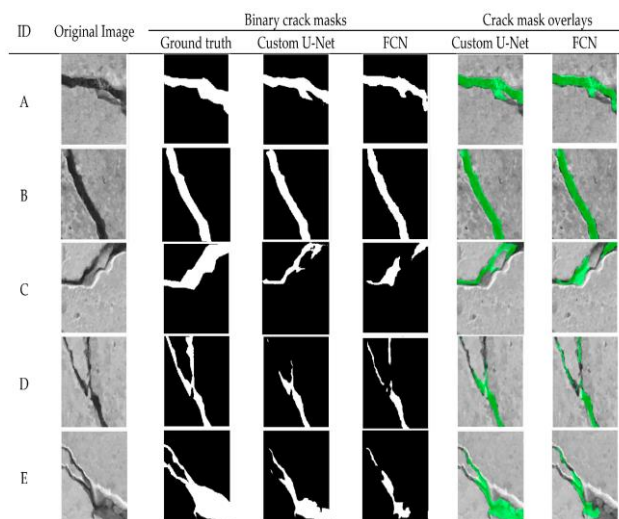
“Deep Learning for Concrete Crack Detection and Measurement”
